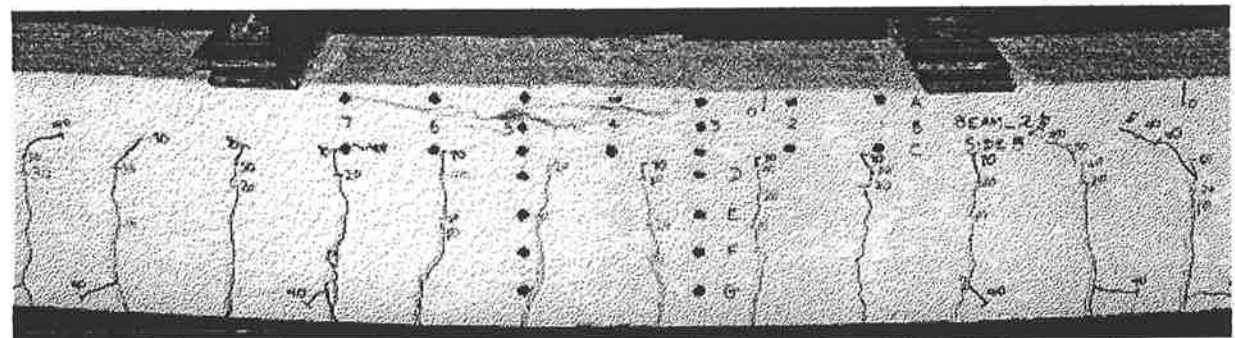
Beam 2 starts failing at 118.8 kN.
